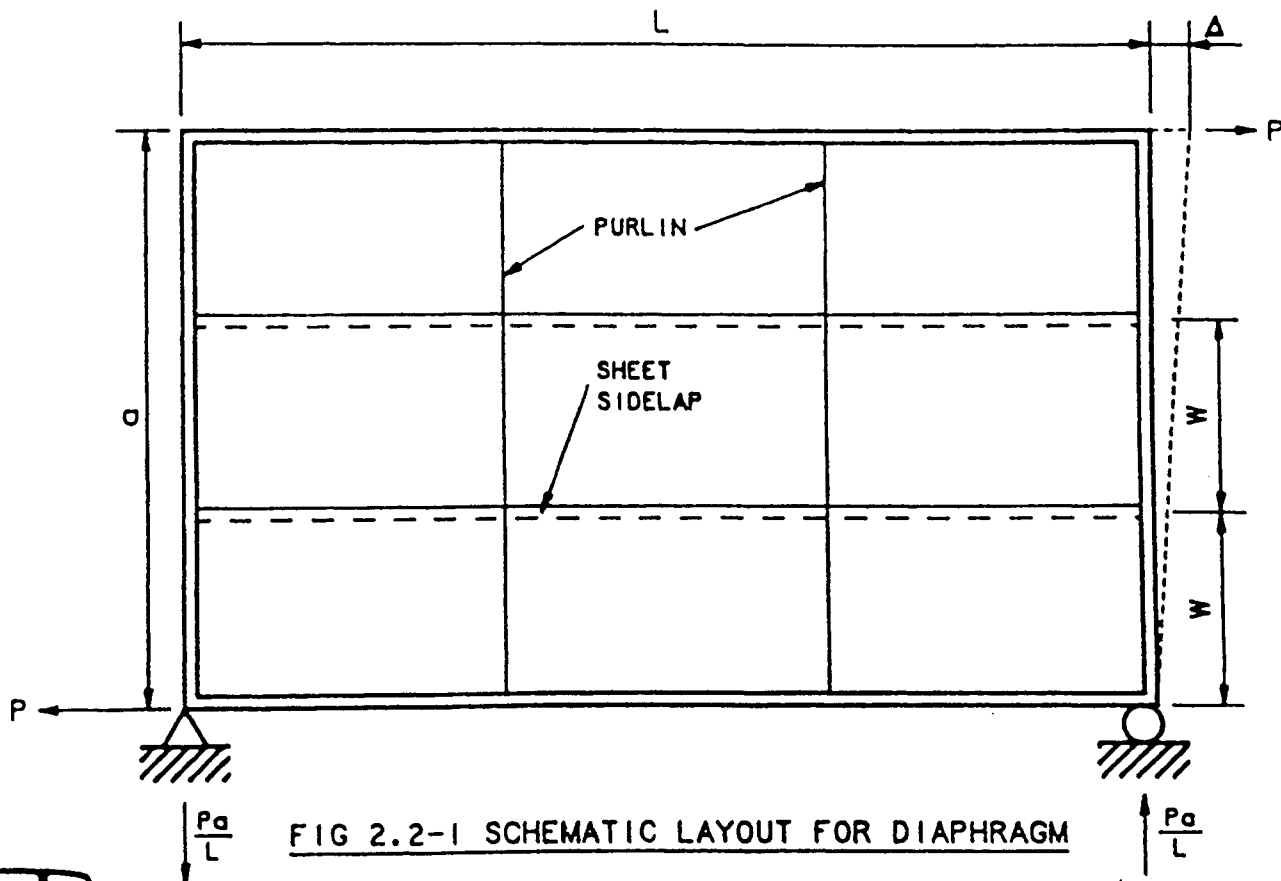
SCHEMATIC LAYOUT FOR DIAPHRAGM
